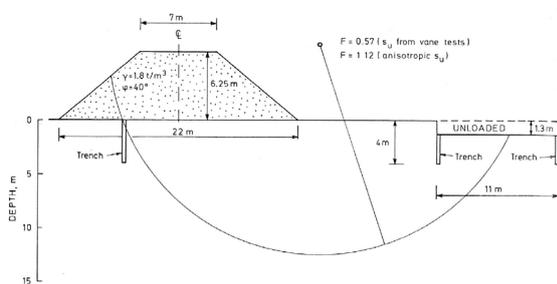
Cross-section of test fill at Ellingsrud (after Bjerrum 1973).
